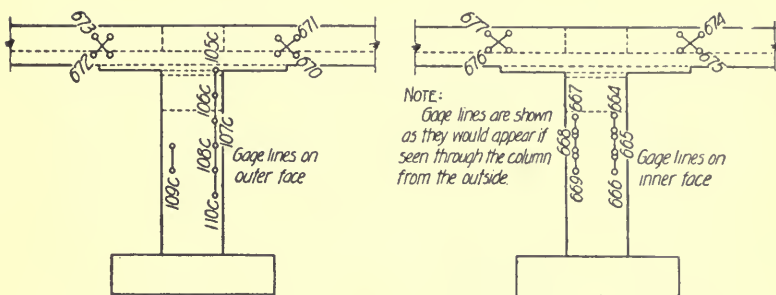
LOCATION OF GAGE LINES ON COLUMNS AND MARGINAL BEAMS OF SLAB J.
